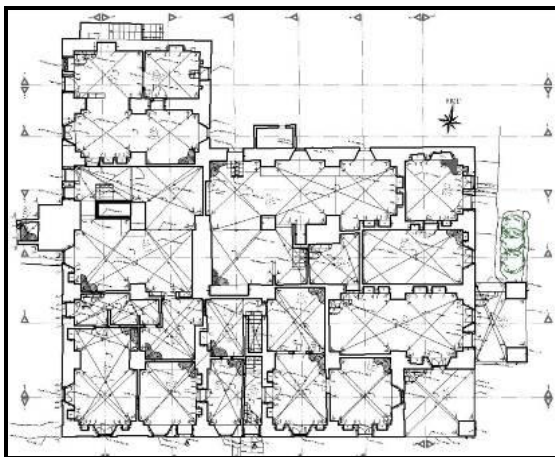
Plan of Ground Floor (Mardin Metropolitan Municipality,2022)
